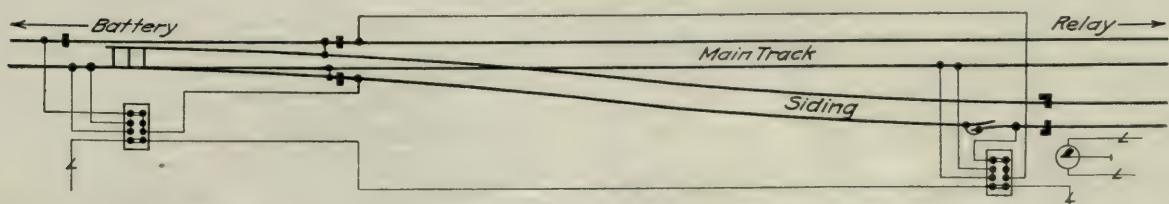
Protection for Switch and Siding Derail; Siding Rail in Series.
